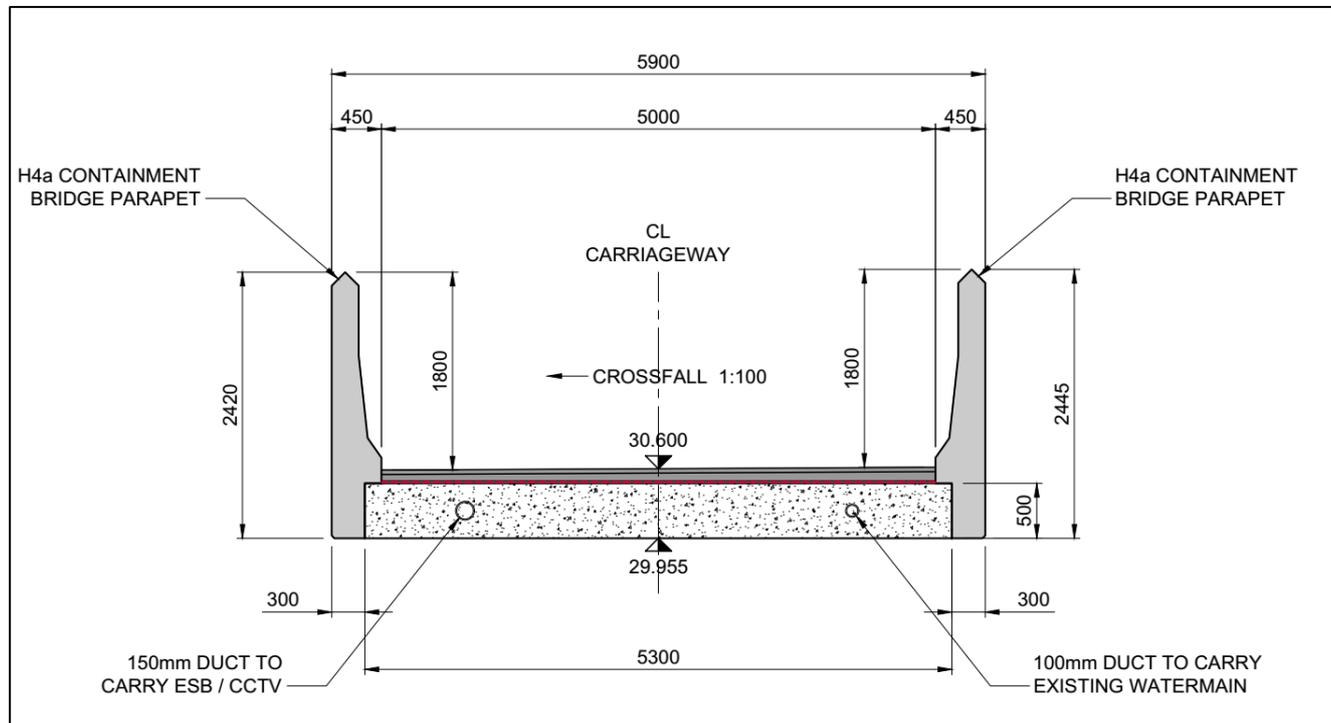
Glasnevin Cemetery Bridge (OBO10) Cross Section – Facing North
